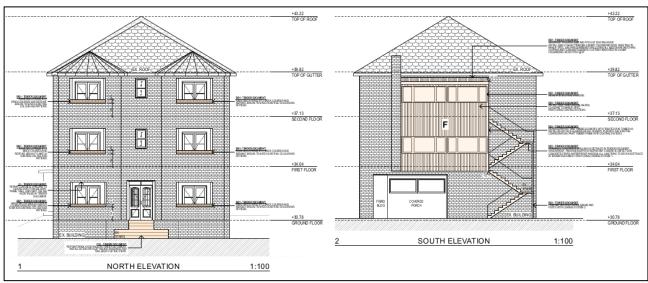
Main dwelling north and south elevations. Source: PlanShop
